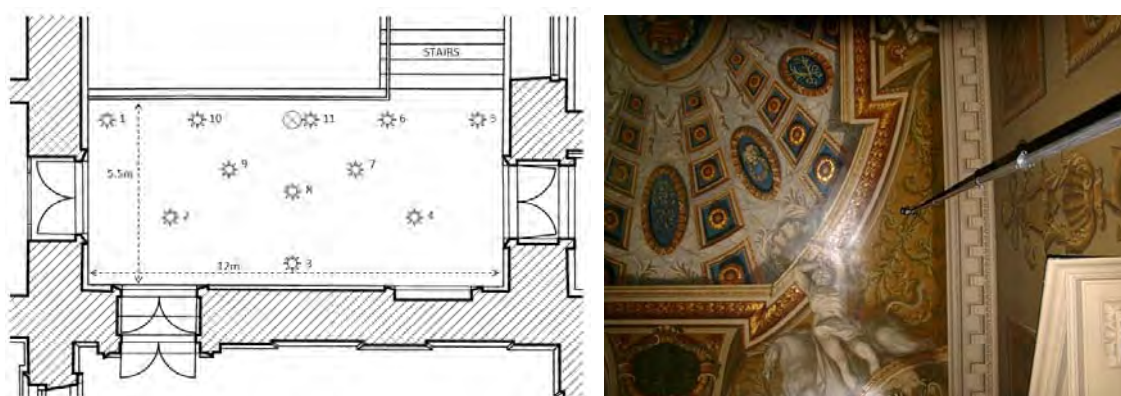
(left) Floor plan of landing of Queen's Staircase, showing locations of camera and flash; (right) Mast with flash light fully raised in location 1. The target area is the oval garland on the left.
